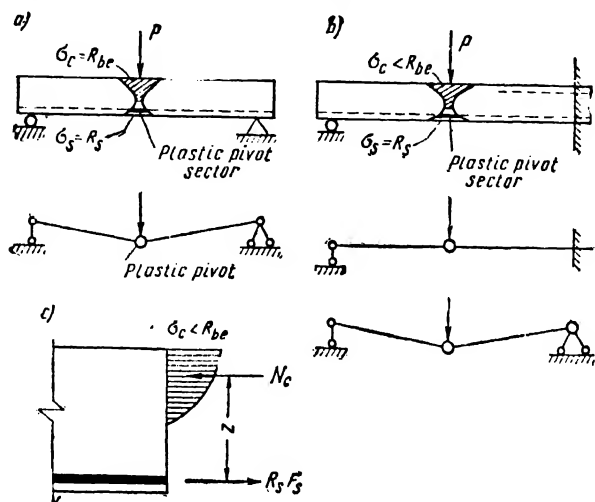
Creation of a plastic pivot in reinforced concrete beams
